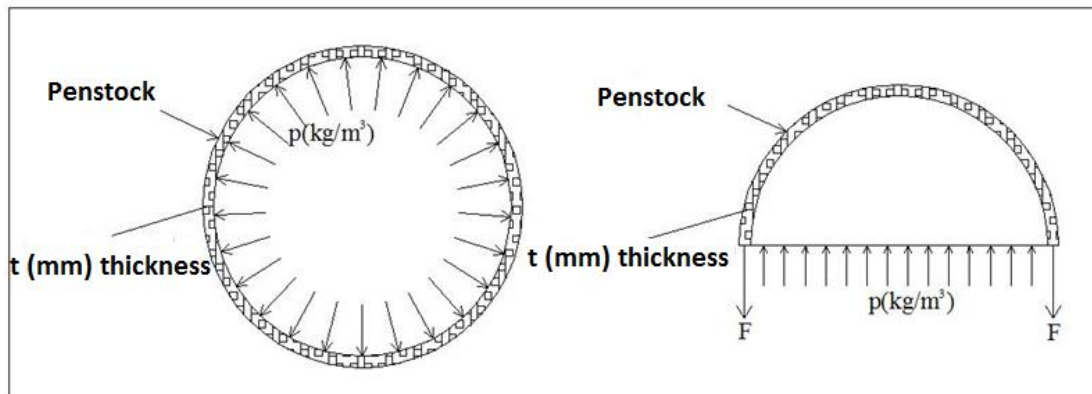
Penstock Cross-Section and the Forces and Pressures on it (Çalamak, 2010)
